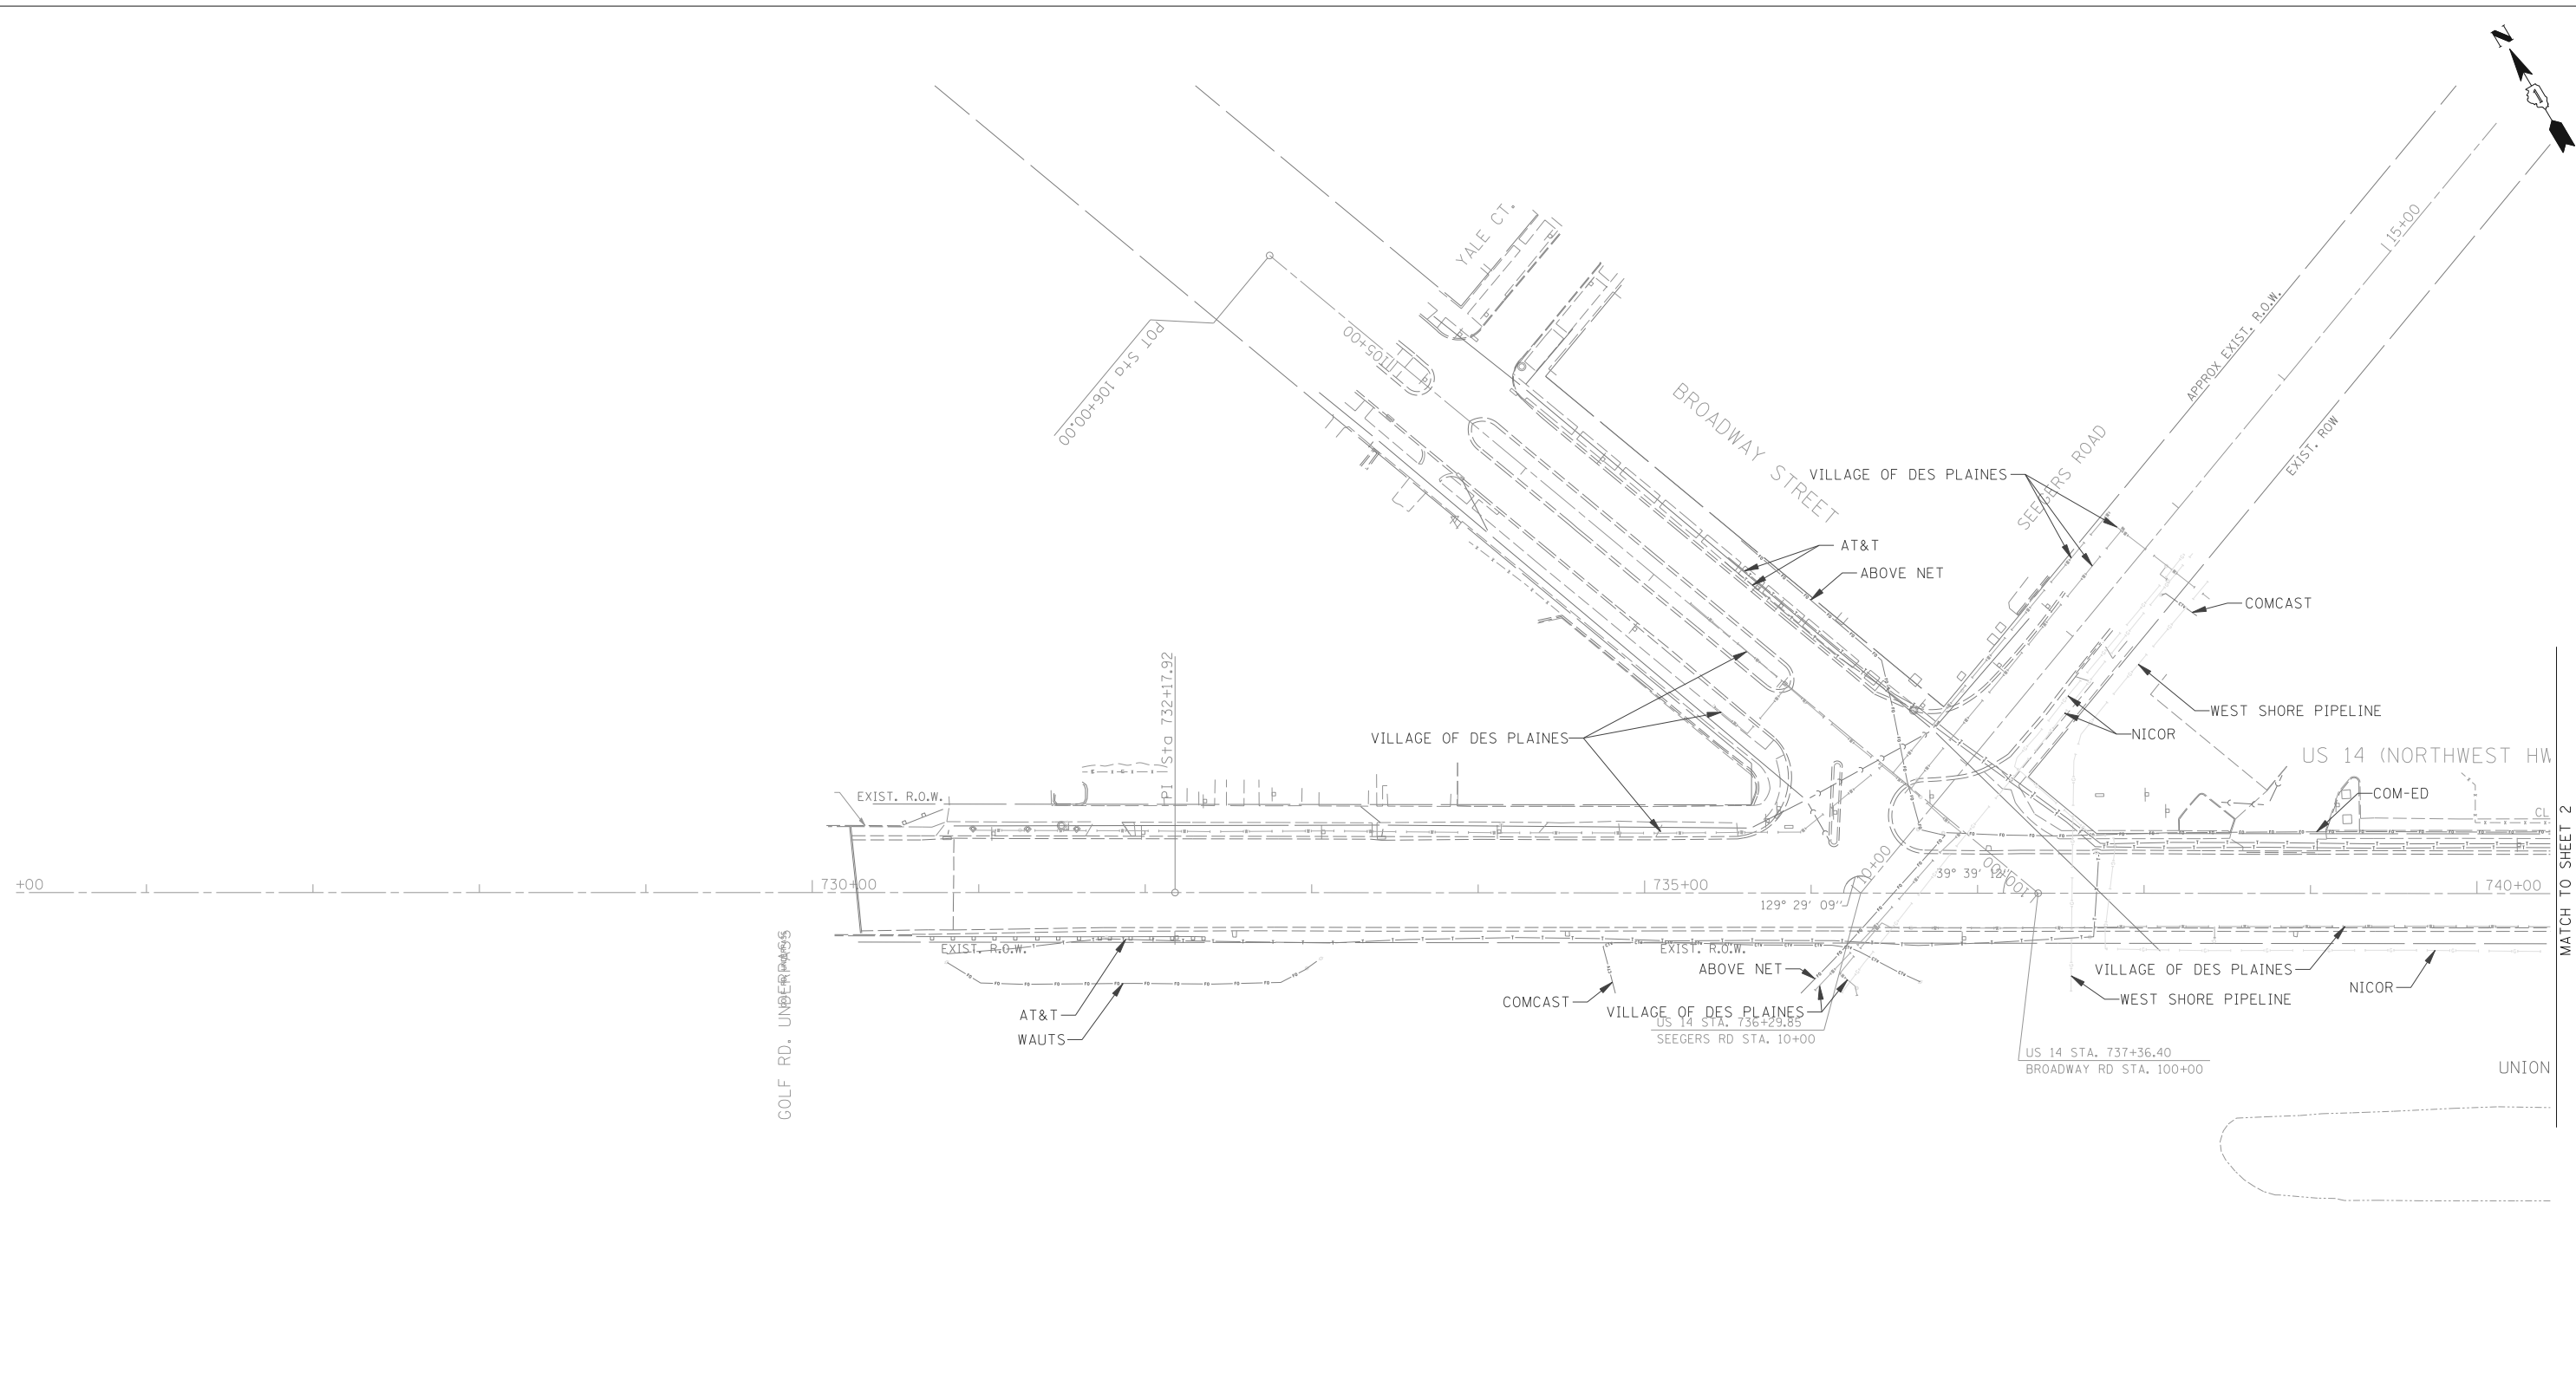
SINGLE PLAN AND PROFILE FULL LINE
